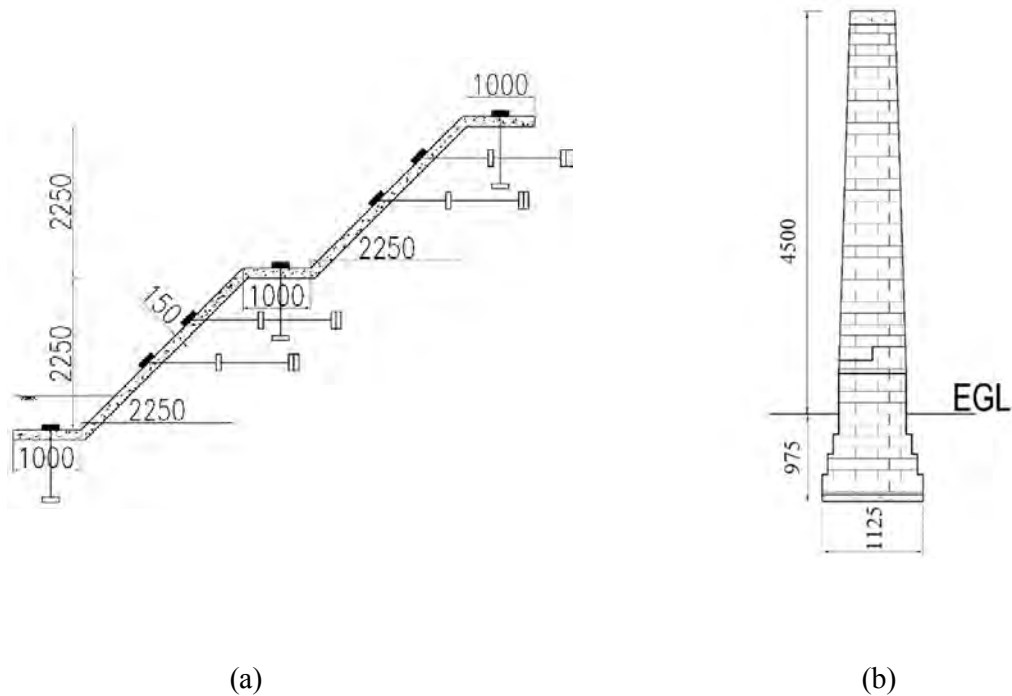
Haor slope protection solution: (a) revetment stone protection proposed by Kabir et al. and (b) Masonry wall type protection.
